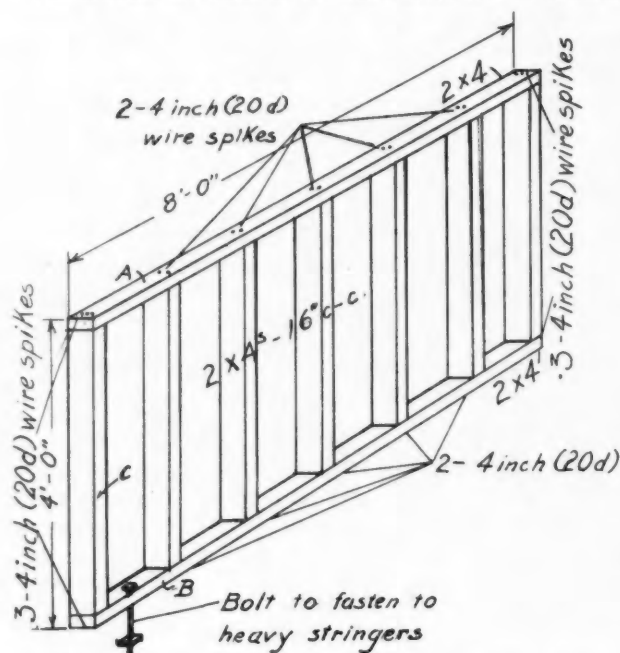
Frame for Testing Built Like Regular Stud Wall.
